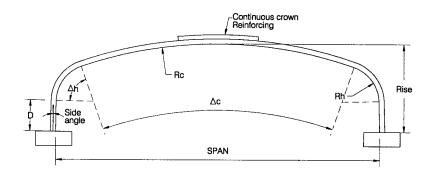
Reinforcing rib details for 6 x 2 in. structural plate box.
